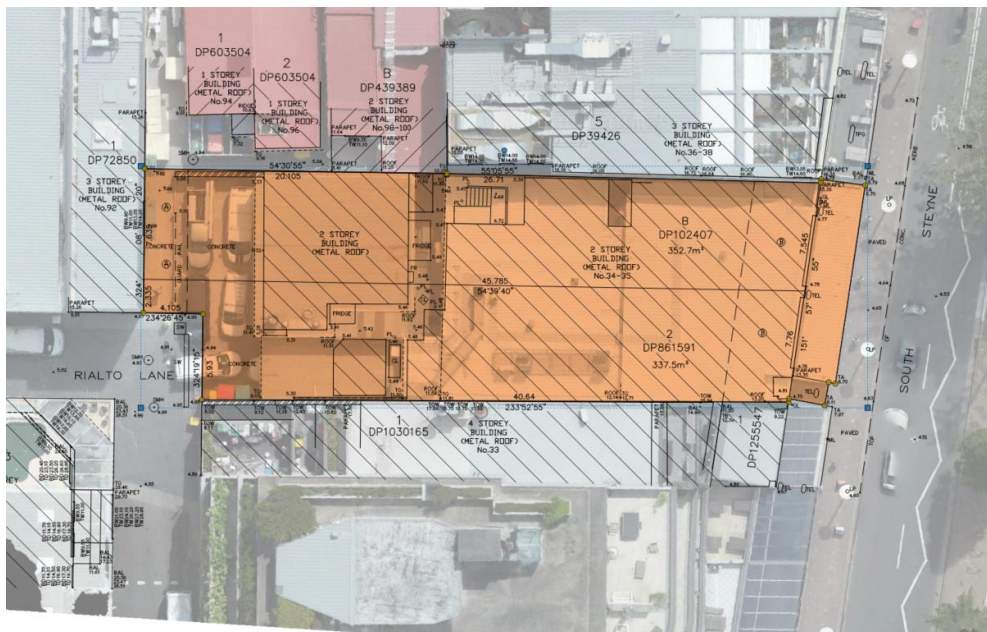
Marked up Site Survey Plan (Source: Hill & Blume Consulting Surveyors Ref 63239 Rev A)
